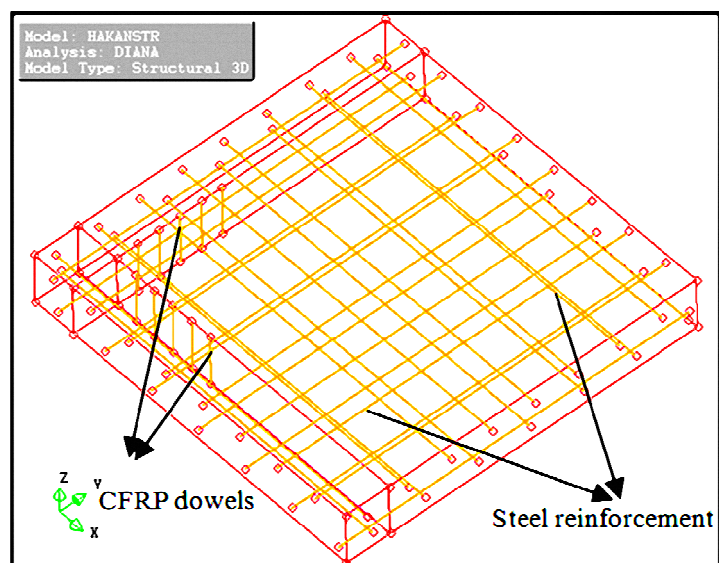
Modeling of steel reinforcement and CFRP dowels
